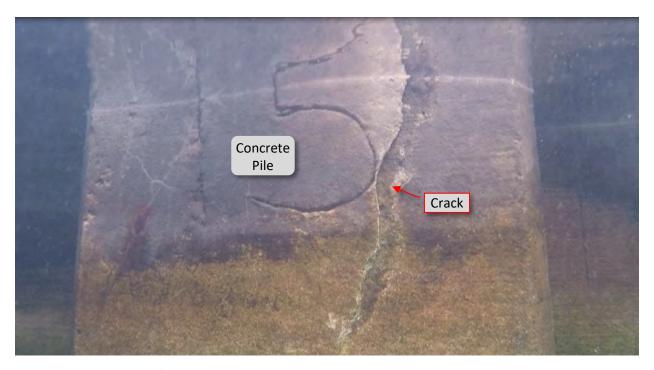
P3. STA 1+72. Crack/spall at pile. Underwater view.
